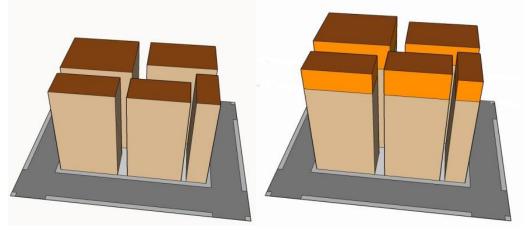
A Showing block at maximum height and adjusted height to allow achievement of maximum floor area
